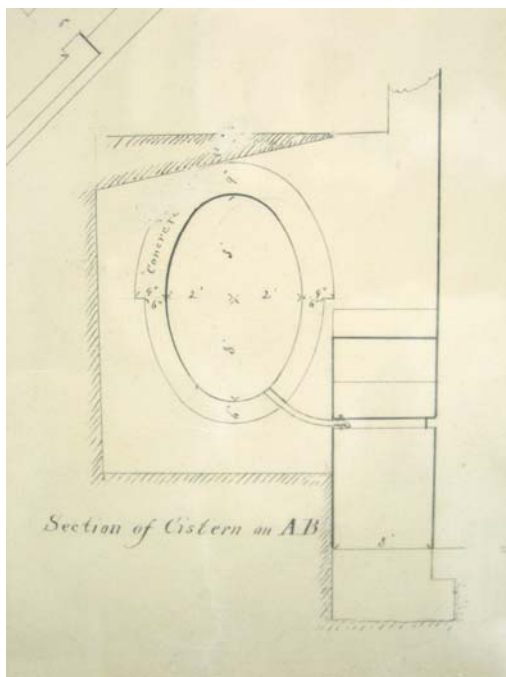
Detail showing subterranean cistern behind barracks, from drawing dated December 1839.
